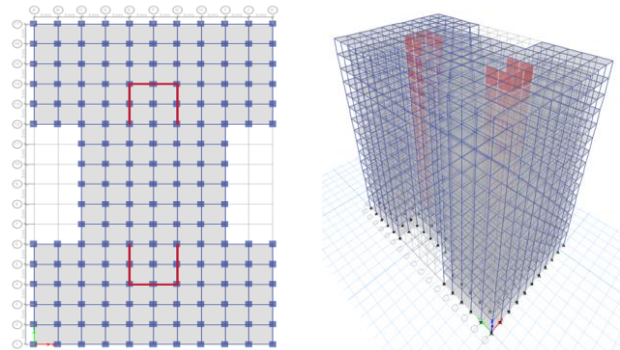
20 Storey I-2 and I-3 shear wall Building Plan
